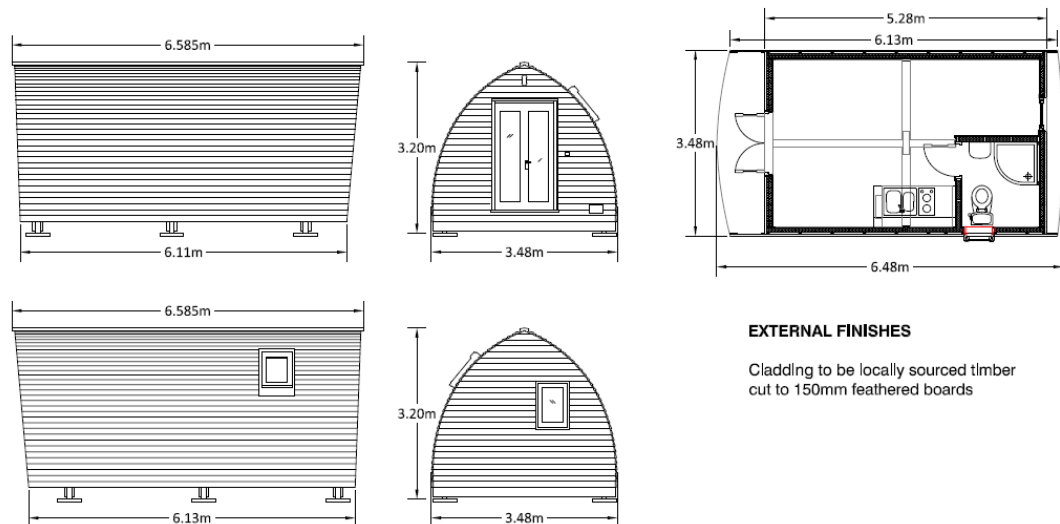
Plans and Elevations (Extract from Drawing No 014/0914/04 – for information only)
